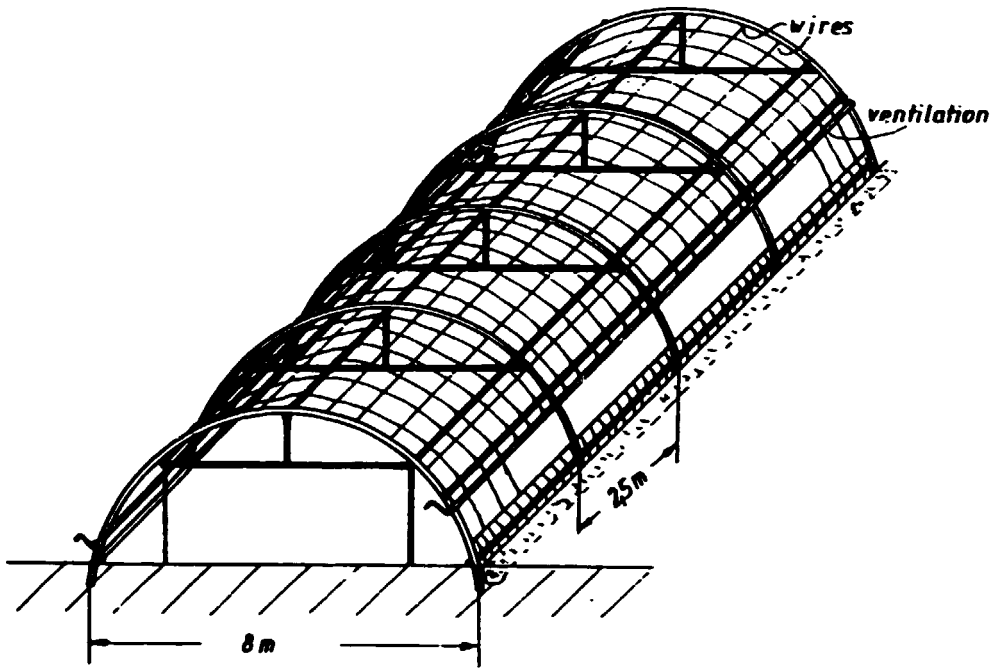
Tunnel greenhouse with rolling-up ventilation.
